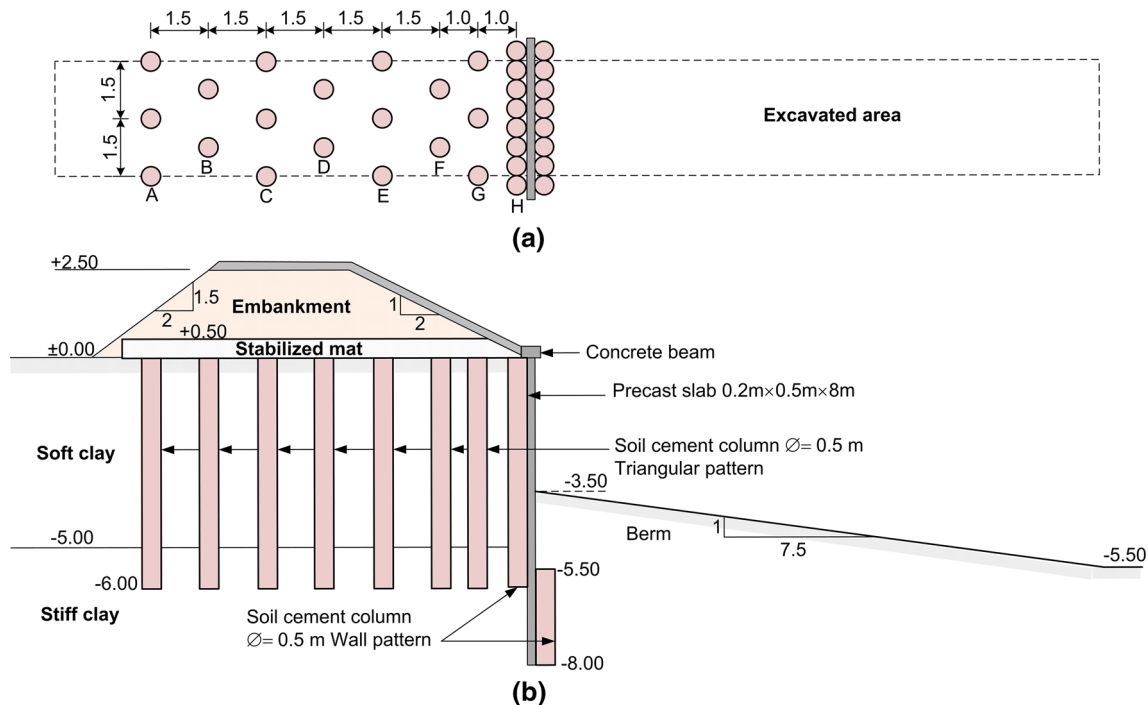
CDCM wall layout a plan view, b section view
